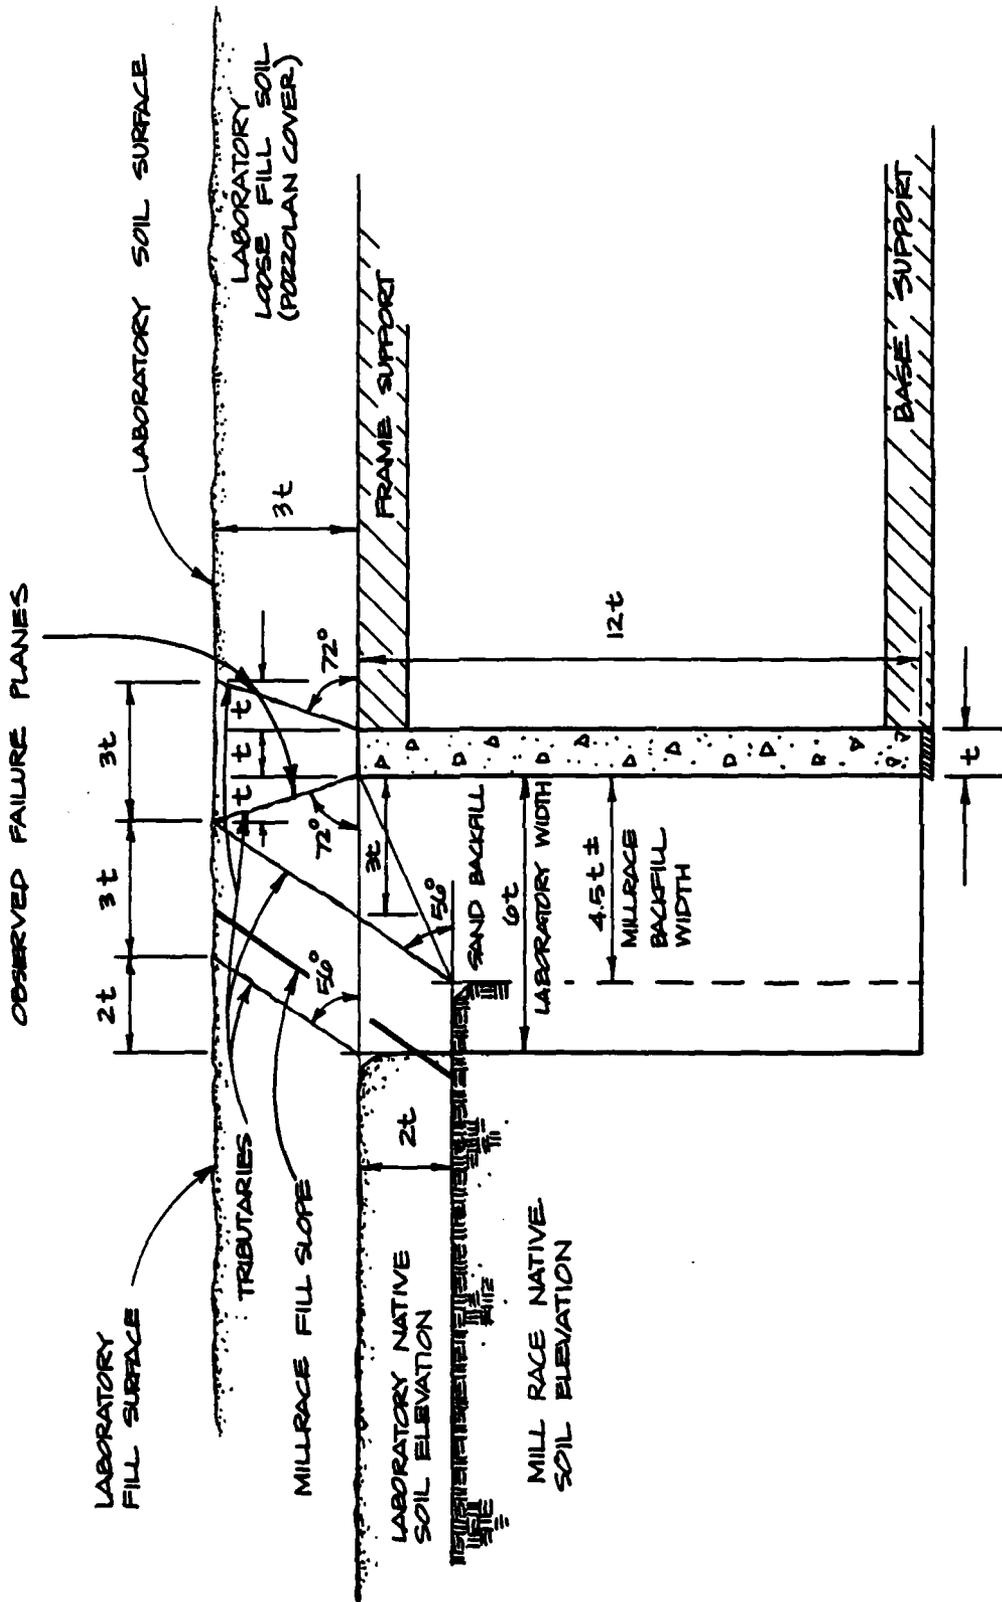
Laboratory Simulation of Soil Arching and Tributaries (1/20 scale) with MILL RACE Test Soil Configuration Superimposed.
